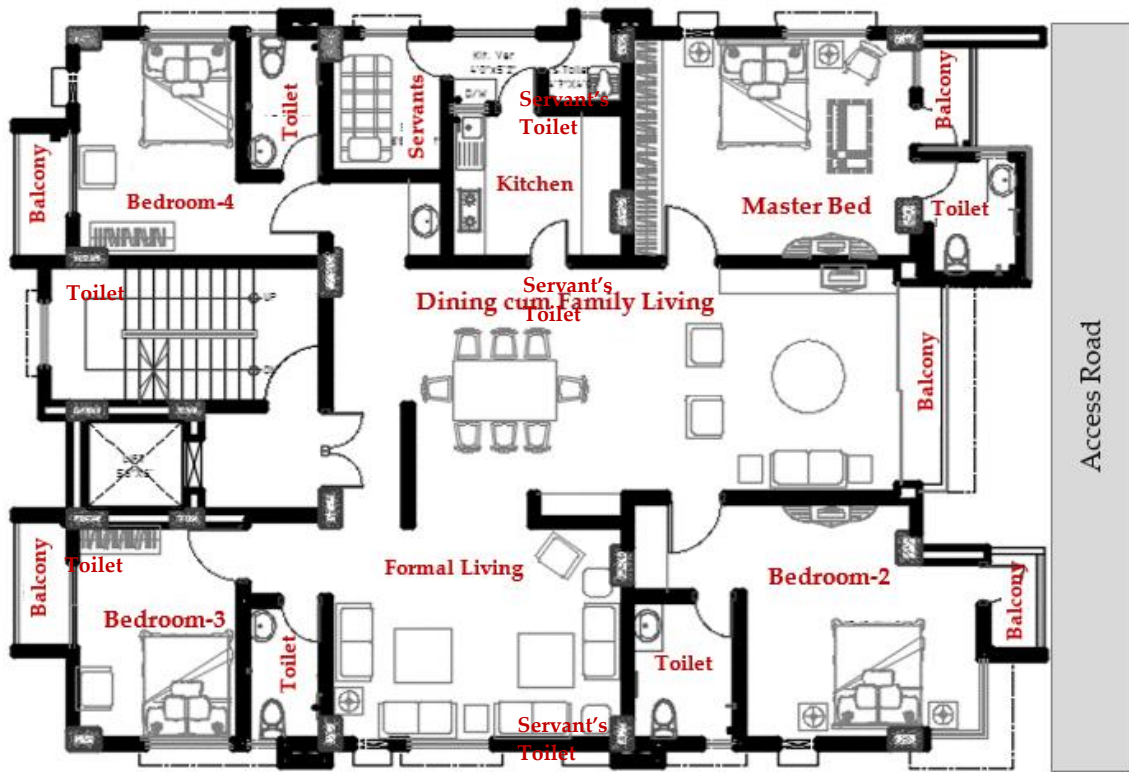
Example of a Single-unit Apartment Layout. Source: Field Study
